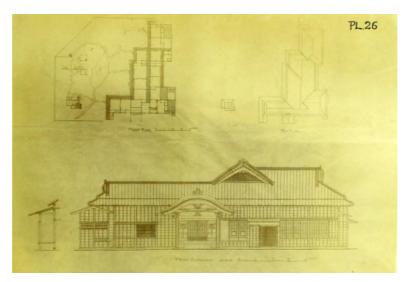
FLOOR PLAN, ROOF PLAN and FRONT ELEVATION.
